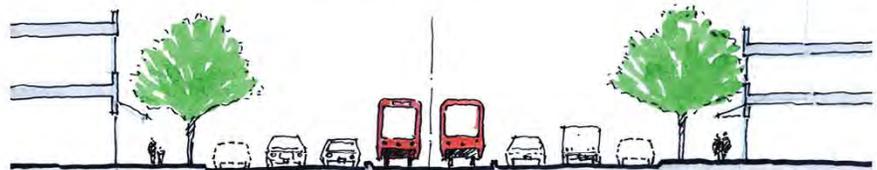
Alternative 3 - Low-Floor Light Rail (LRT)
